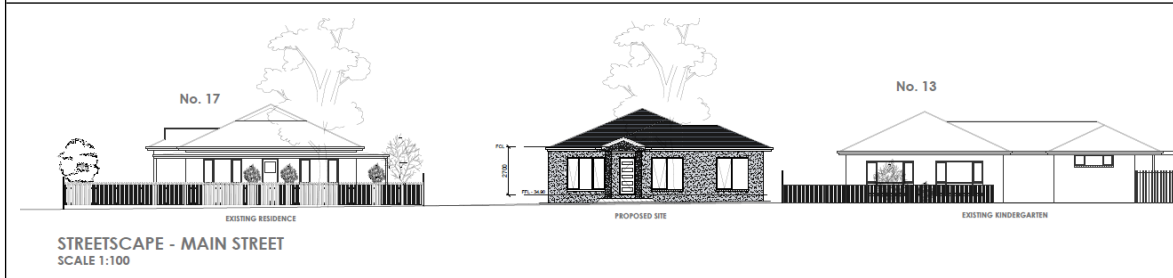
Revised streetscape plan showing Dwelling 1 as single storey
